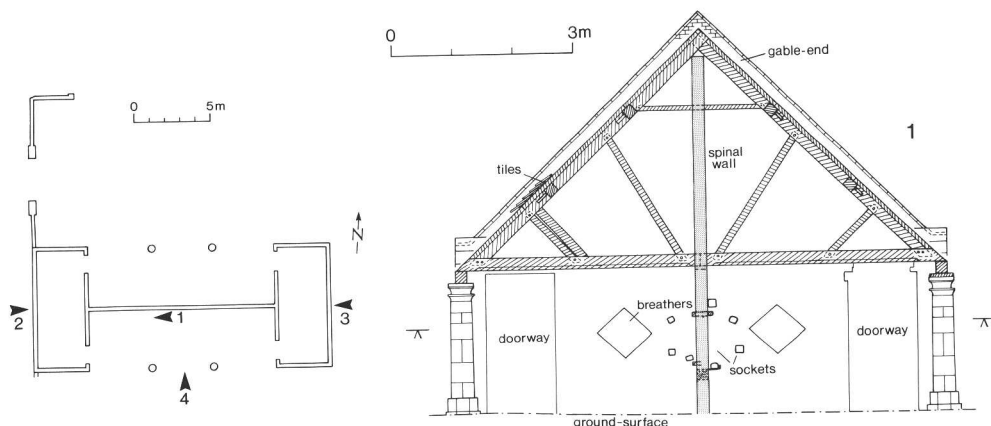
Calke Park: ground-plan and cross-section of the deer-cote, recorded by RS; timbers are hatched; in the background of the section, features of the eastern wall of the western chamber are shown in outline; scale of plan 1:500, scale of section 1:125.
